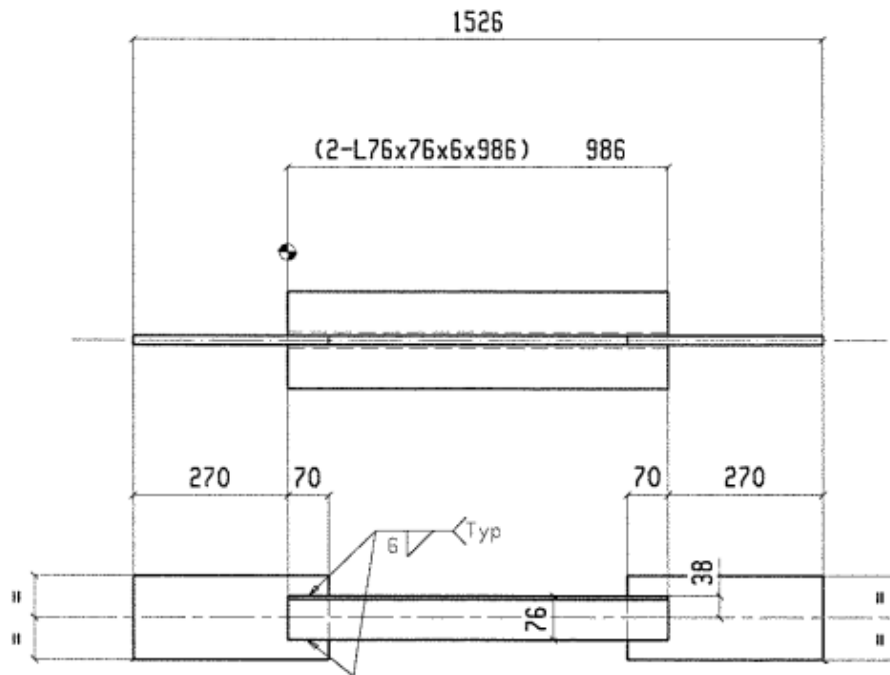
Specimen D02X (parallel welds fracture).
